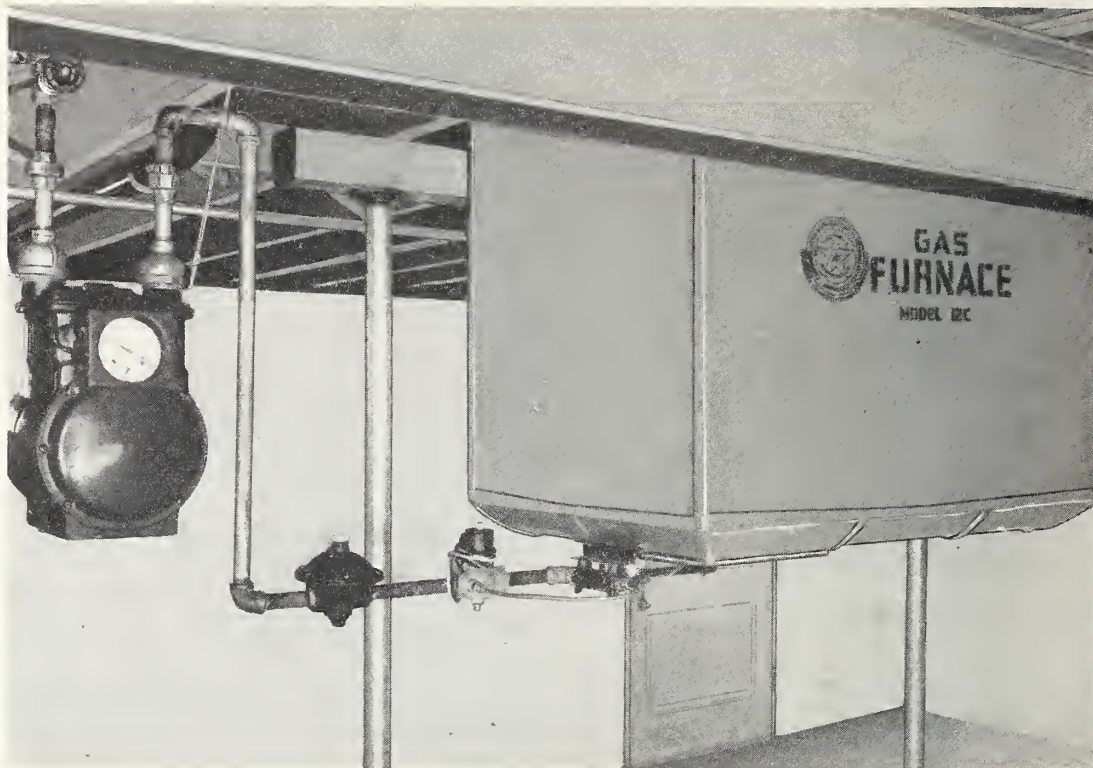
Single gas-burning floor furnace, gravity type, shown from under the floor.
